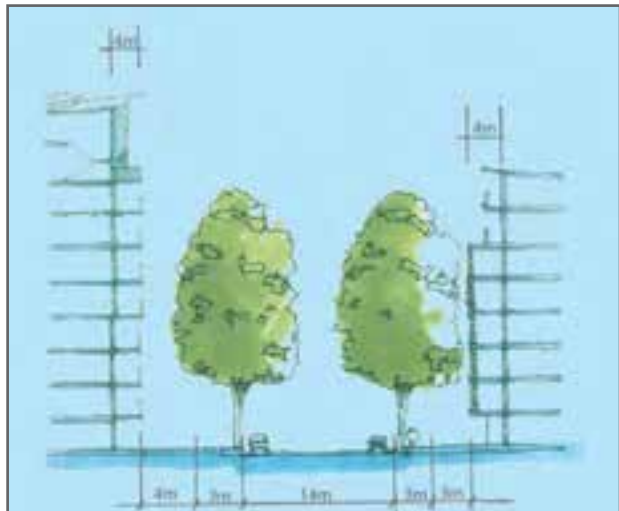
Type E tower element building as viewed from Morton Street looking north
